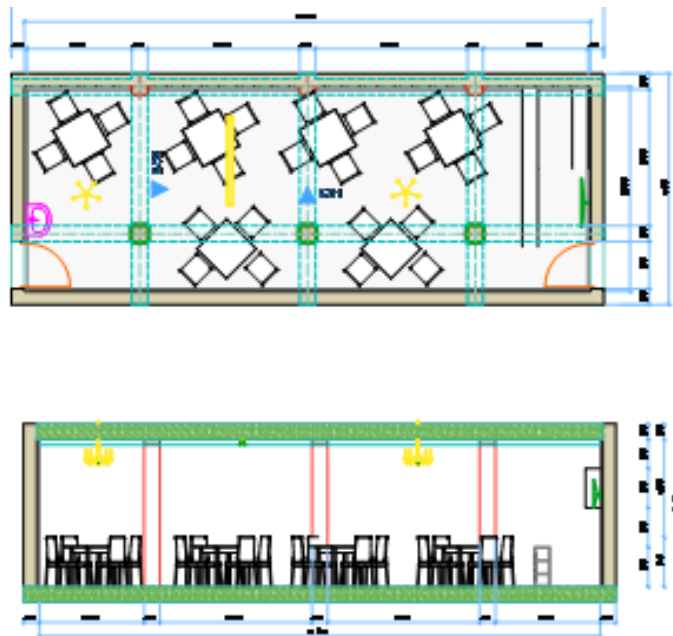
1 Plan & elevation of the existing design of yoeligen hotel restaurant, Source: (Author, 2020)
